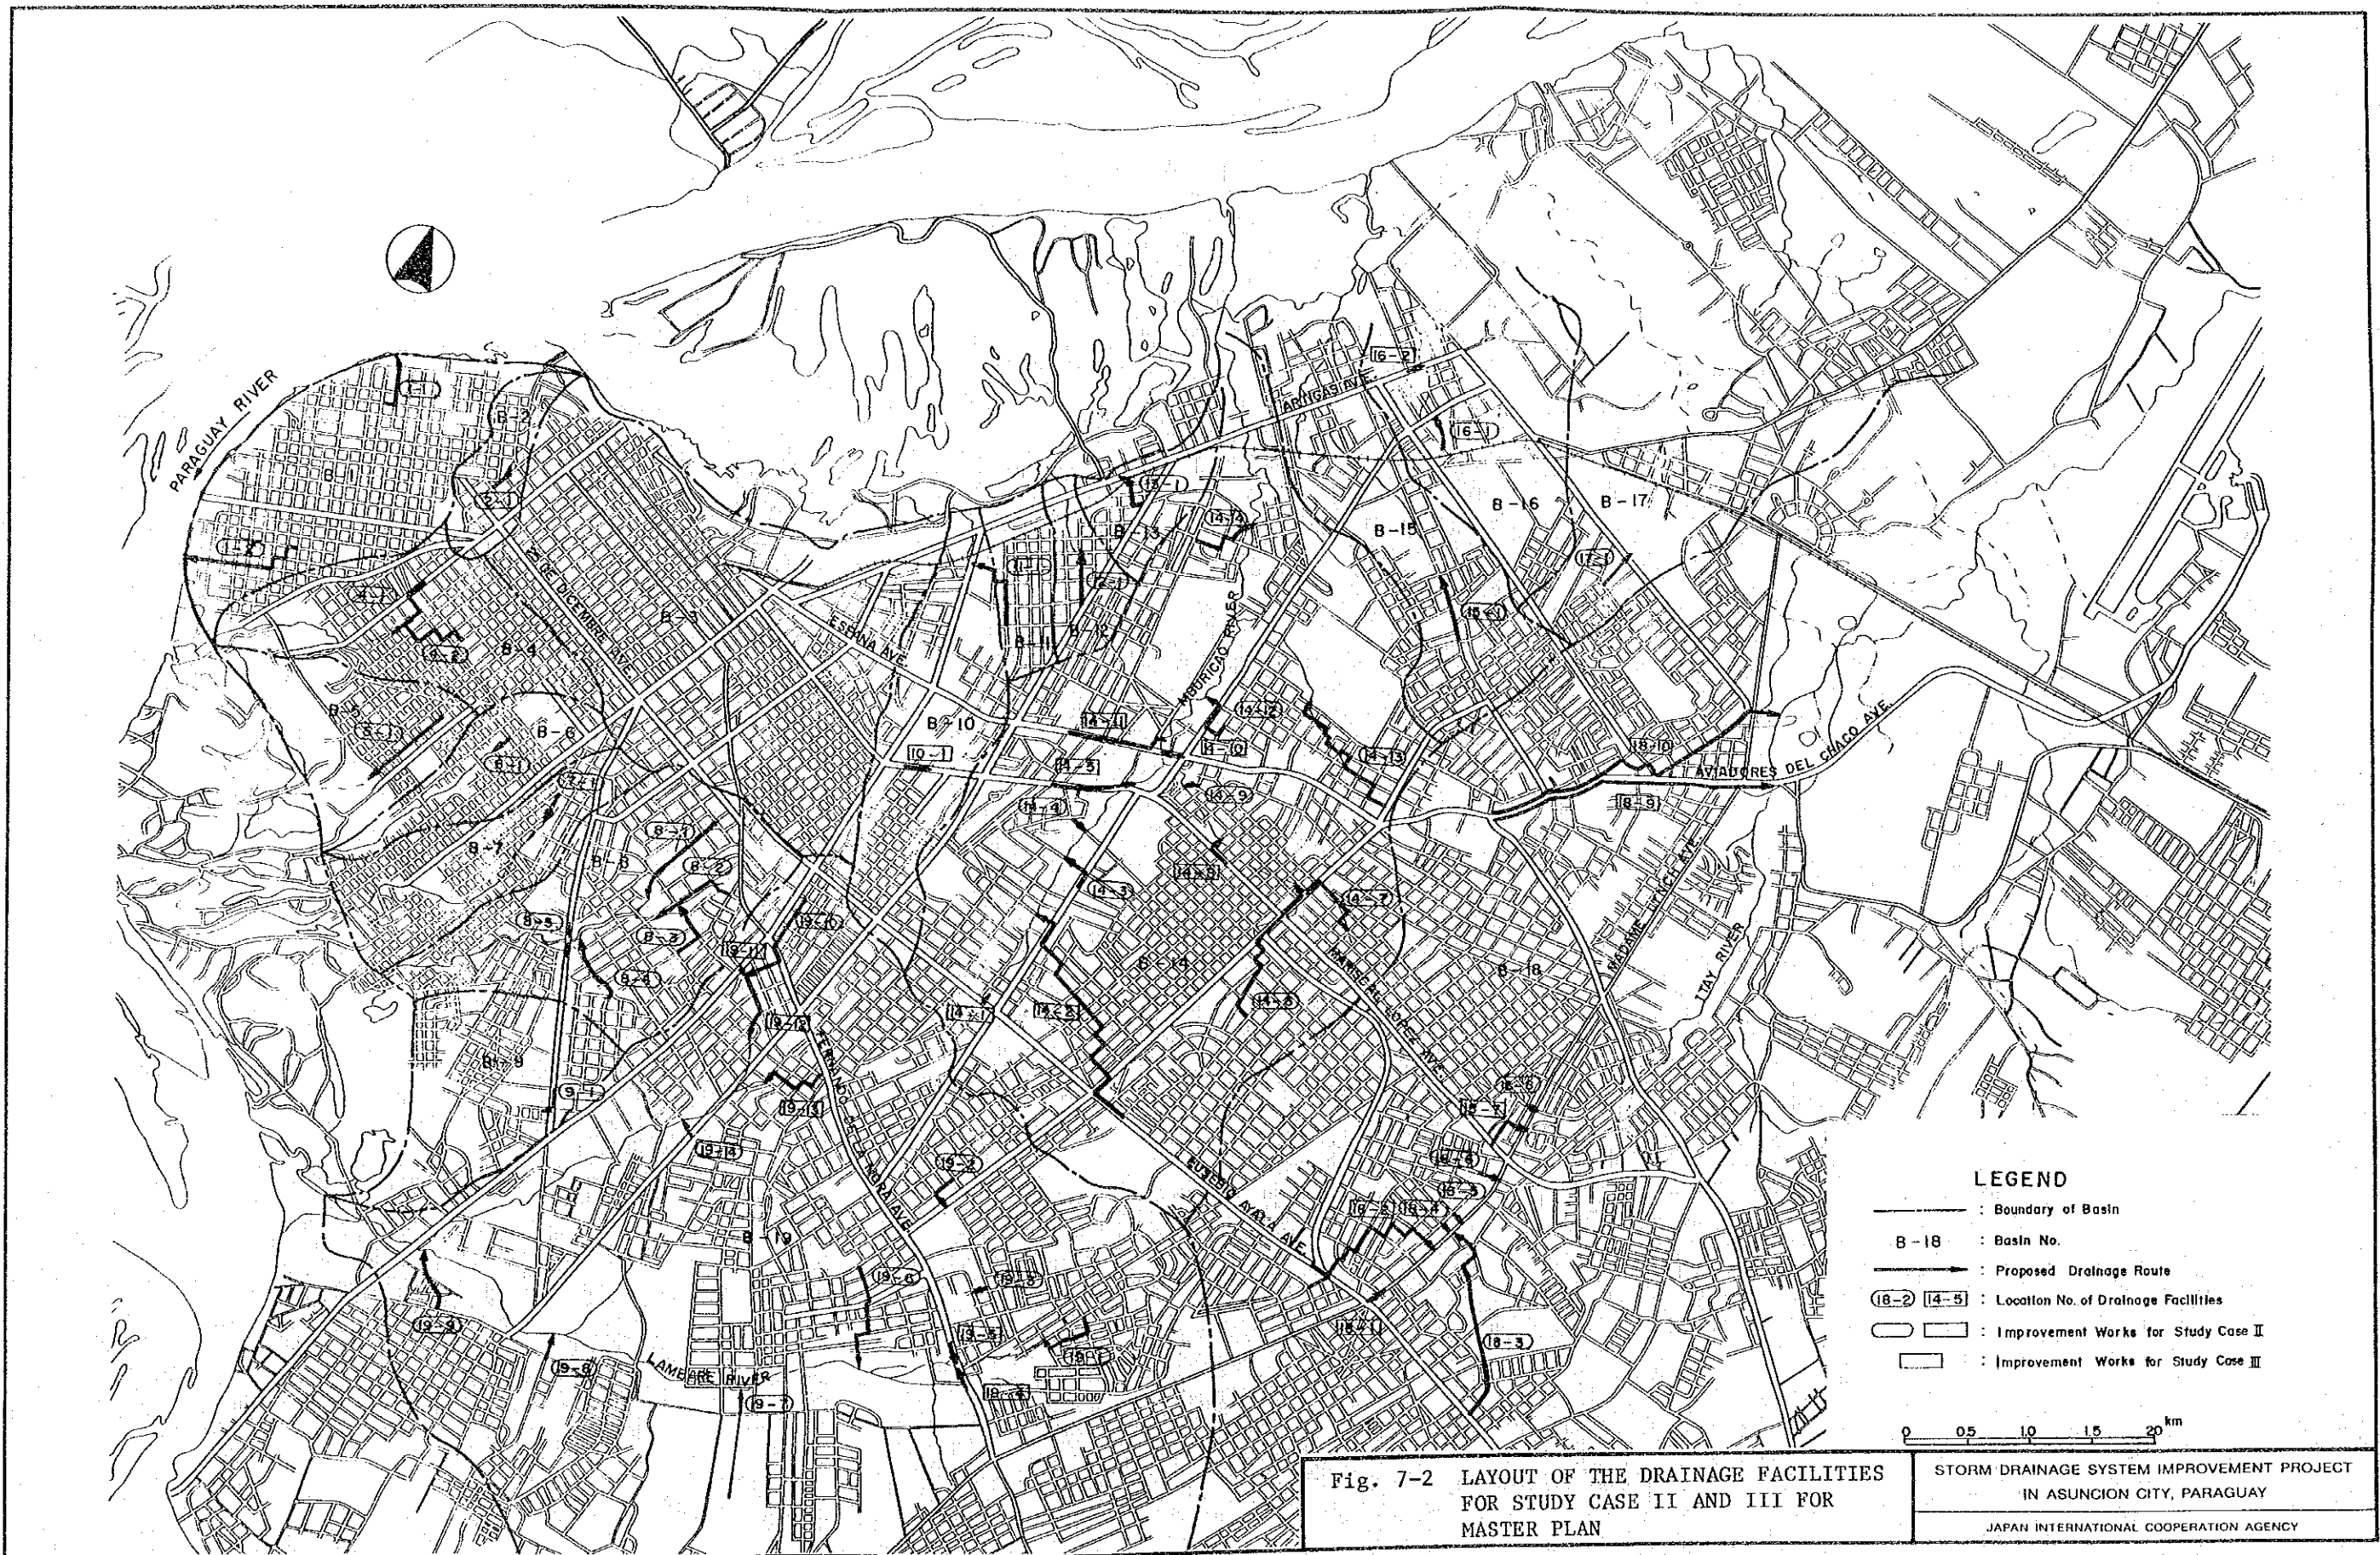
LAYOUT OF THE DRAINAGE FACILITIES FOR STUDY CASE II AND III FOR MASTER PLAN
